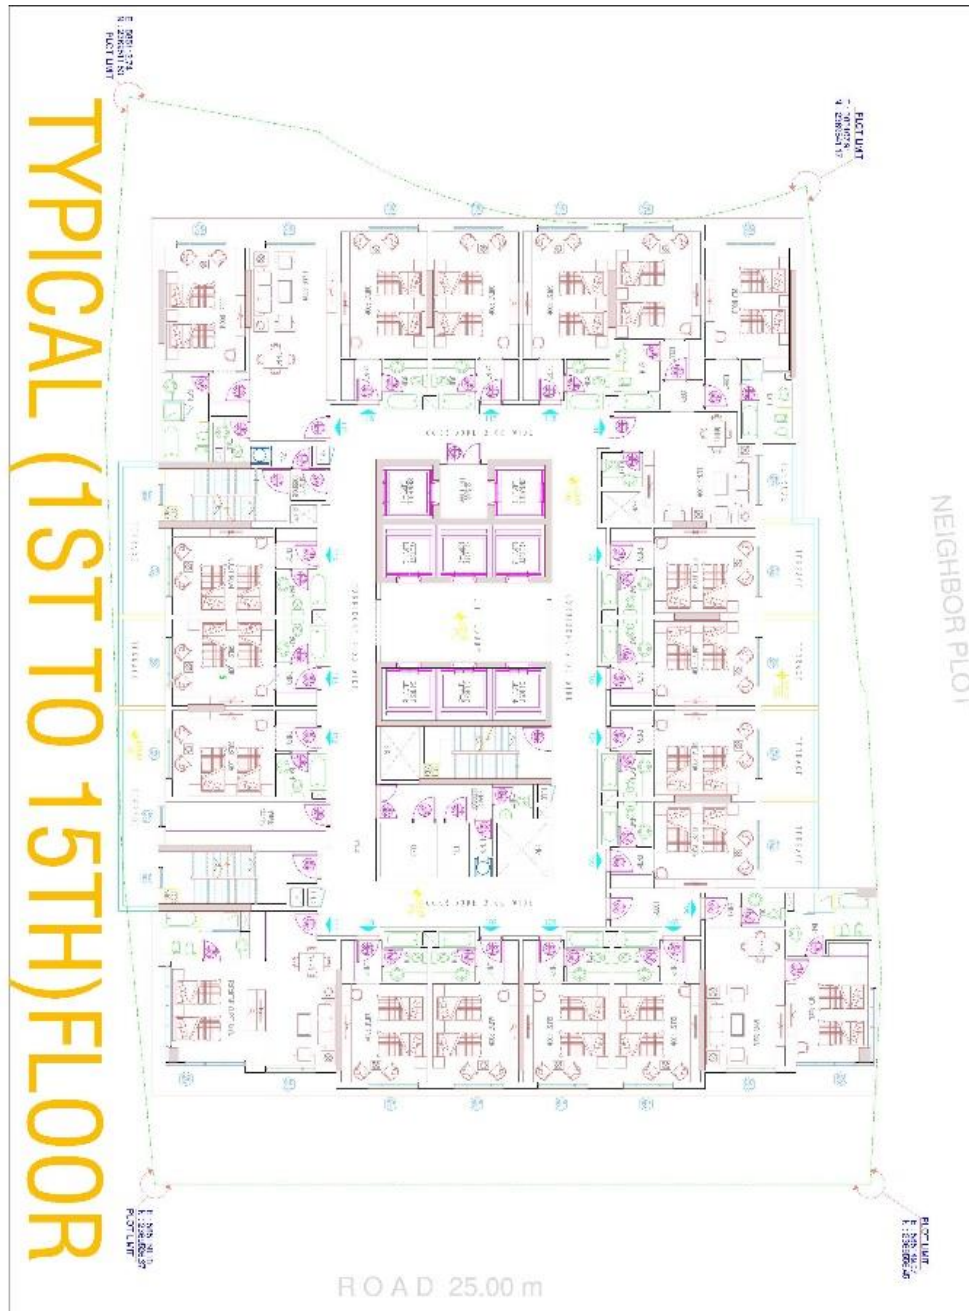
Typical (1ST to 15TH FLOORS) Layout.
